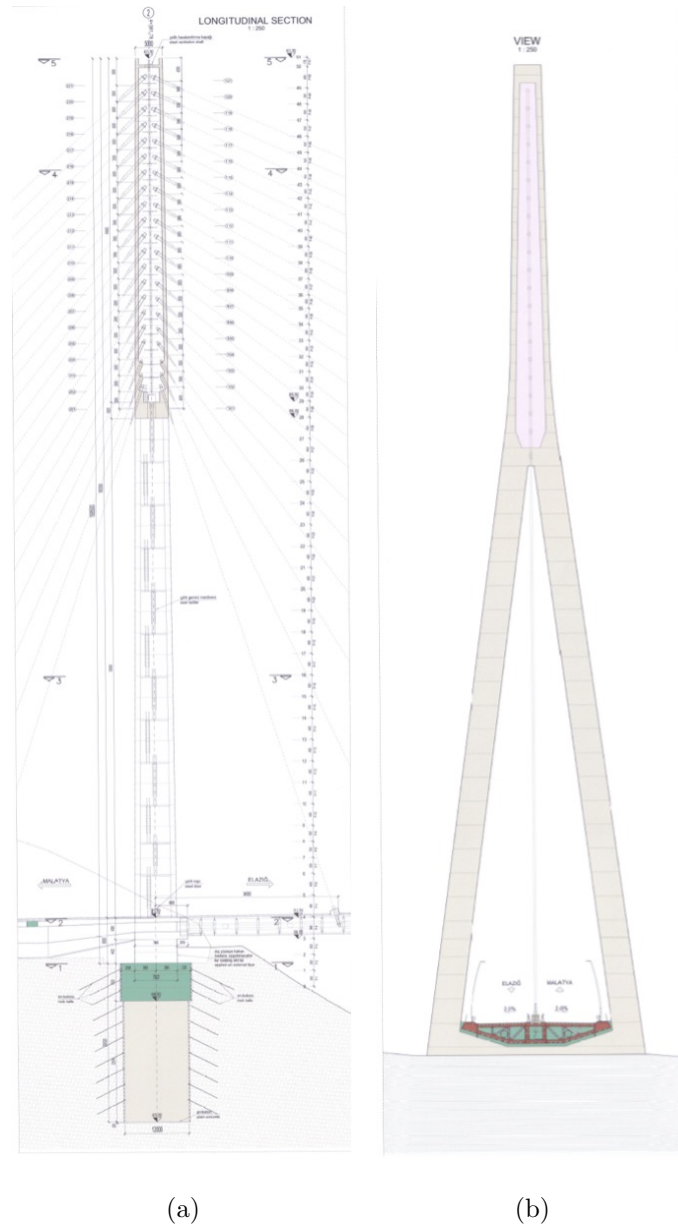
Views of New Kömürhan Bridge: (a) Longitudinal section of the pylon, (b) view of the pylon.
